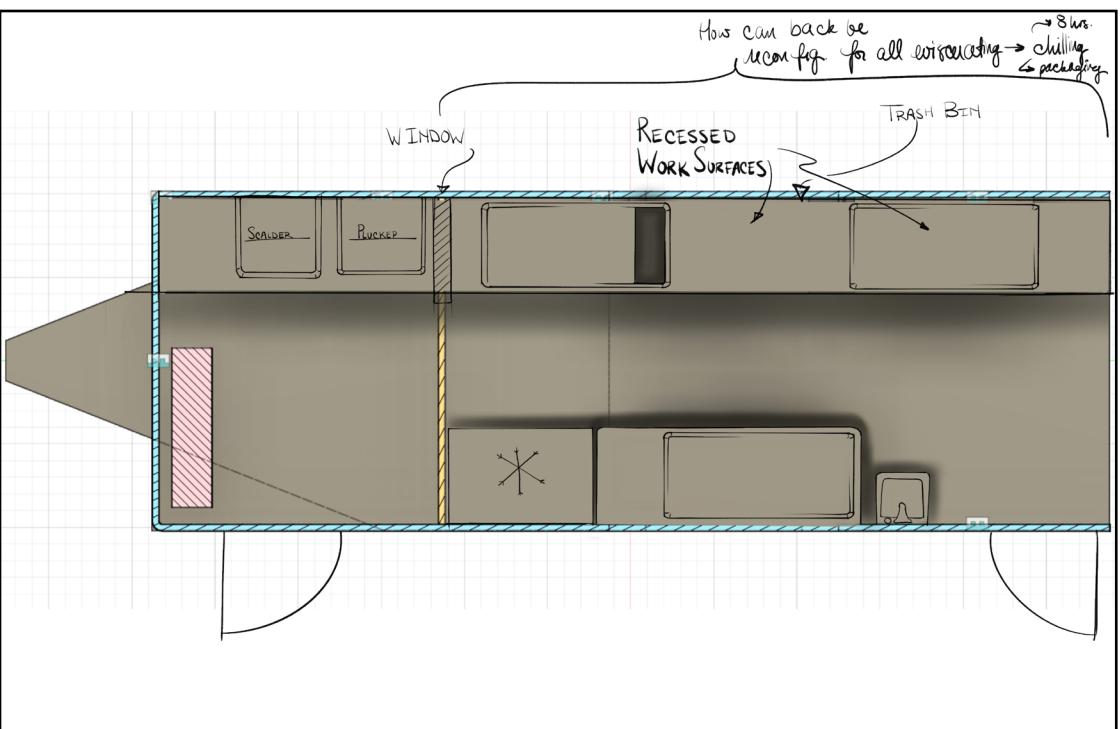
A plan view beginning to design the layout of the workstations and the counter.
